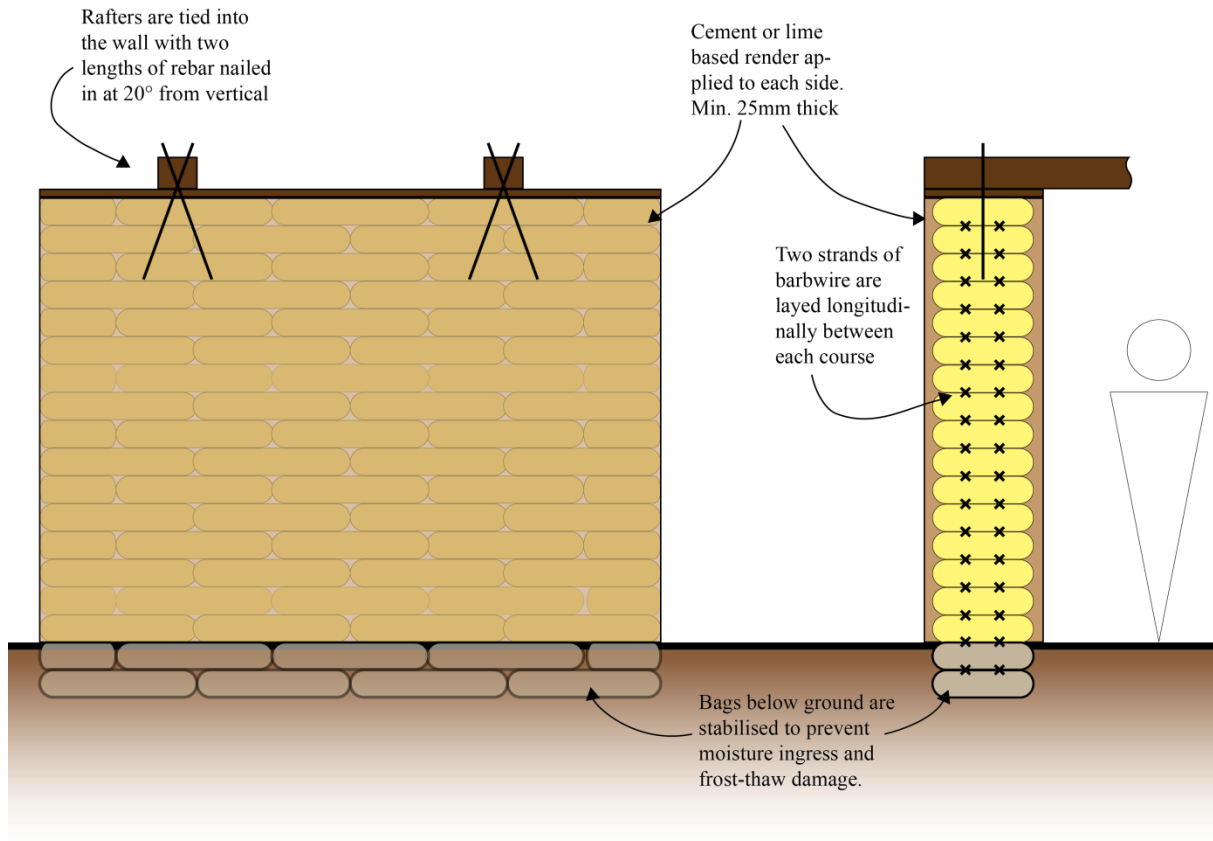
Linear earthbag house wall design, longitudinal section (left) and transverse section (right) (Hunter and Kiffmeyer, 2004)
